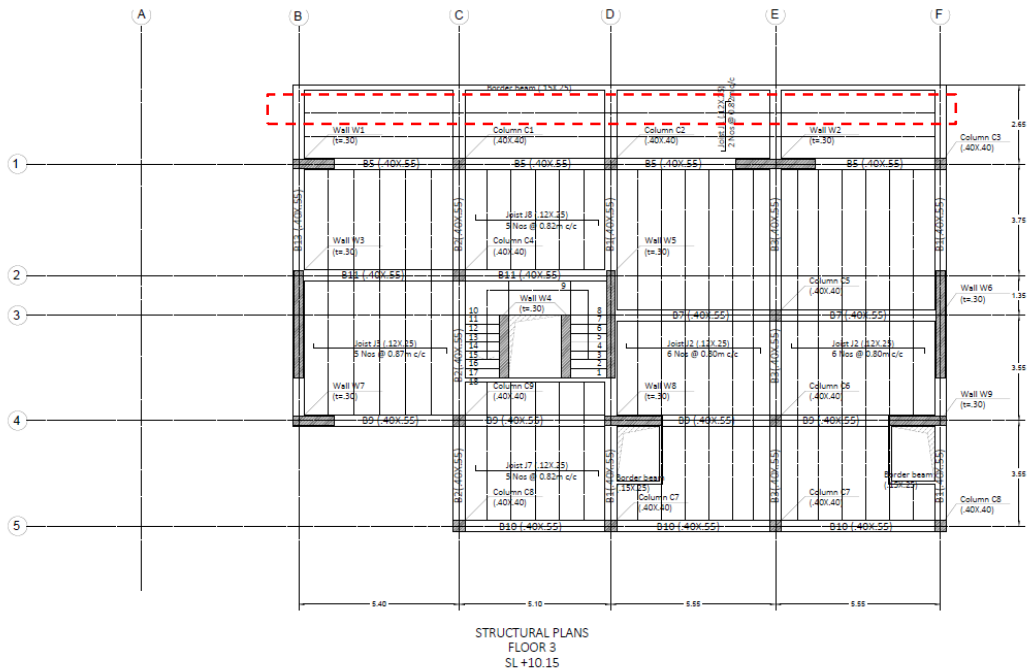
Localization of the joist J-1 in the structural plan of the third floor.
